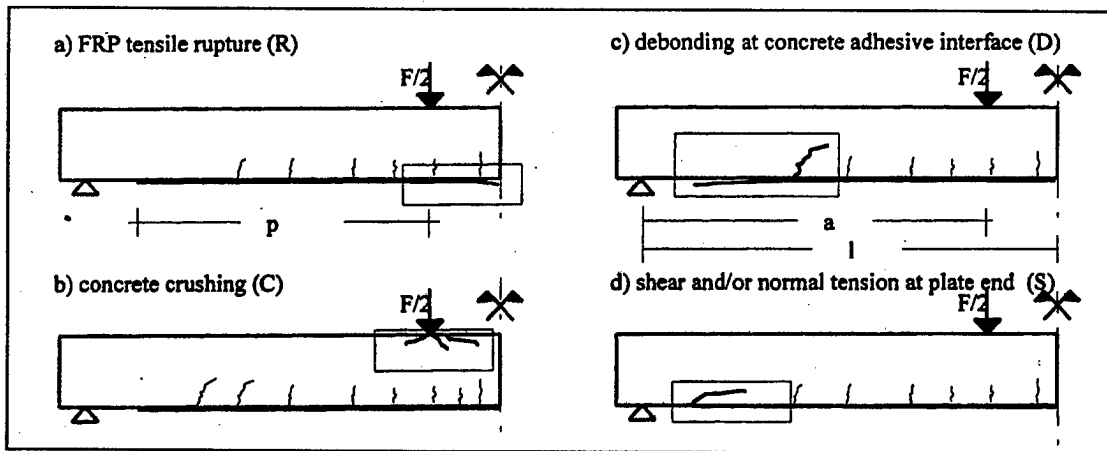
Typical failure mechanisms of reinforced concrete beams repaired with FRP composites.
